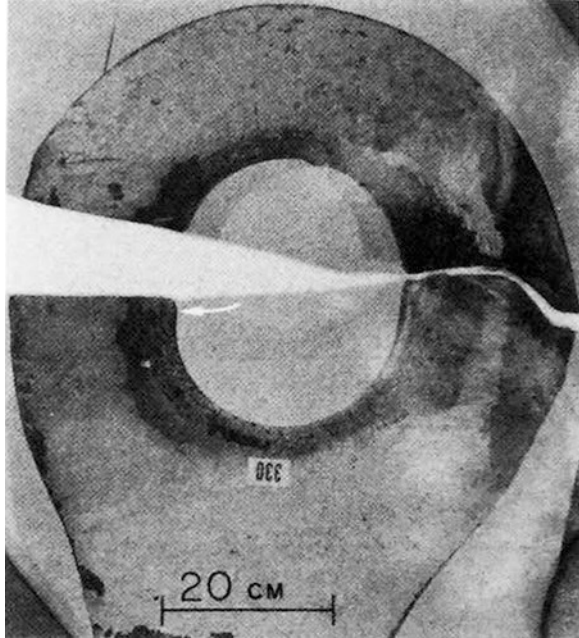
Reconstructed head of eyebar #330. (a) Following fatigue cracking that produced flat fracture of the lower side of this eyebar. The white circle corresponds to the size of the pin, 280 mm in diameter. The white line on the lower side is the joined position of the flat fracture surfaces. The thin white broken curve on the upper side shows the outline of the shank side of the fractured eyebar (Anon 1970)
